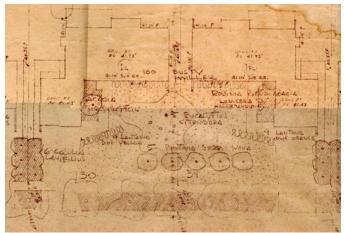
Planting Plan: Lots 23-42 (Detail: Dusty Miller House and neighbor), 1947-1949. Garrett Eckbo, landscape architect.
